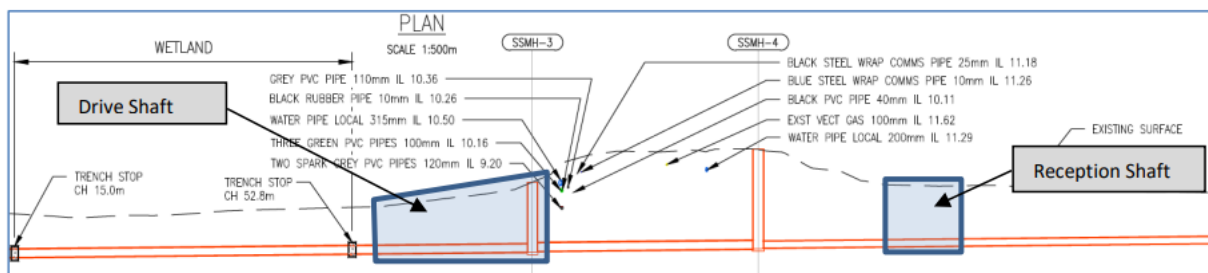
Indicative cross section of pipe hammering drive set up for the Brigham Creek Road works (Source: Brian Perry Civil)
